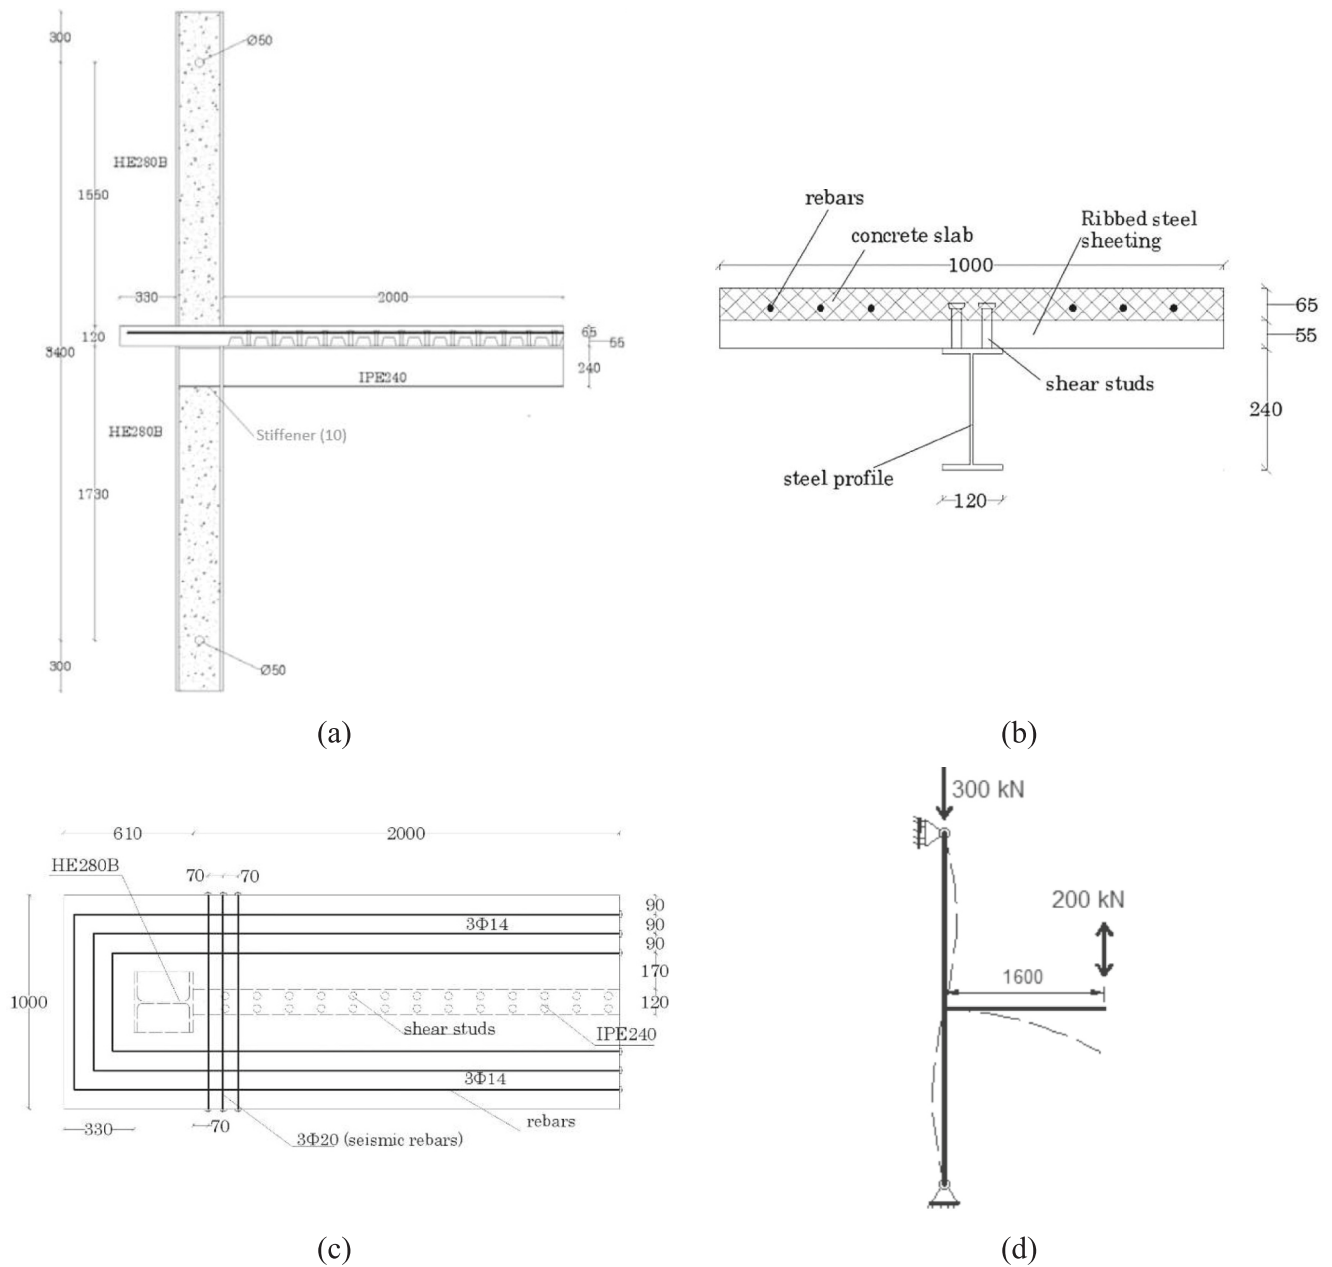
Reference exterior welded joint: (a) side view; (b) cross-section; (c) top view and (d) experimental setup (dimensions in mm).
